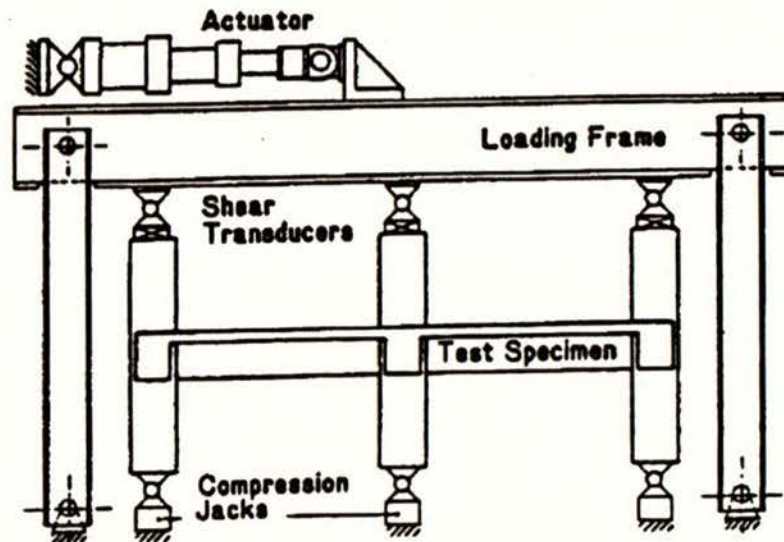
Test arrangement of two-bay frame with floor slab [Z2].
